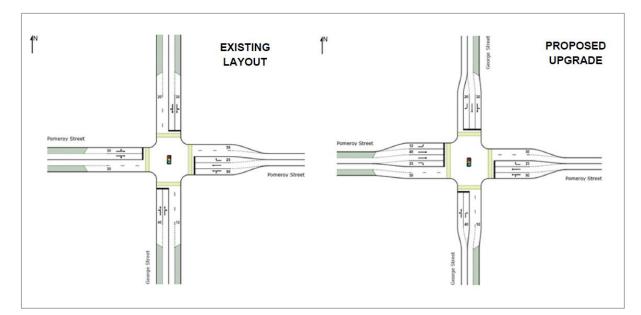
George/Pomeroy Street layout – existing and proposed upgrade (Source: PWC)
